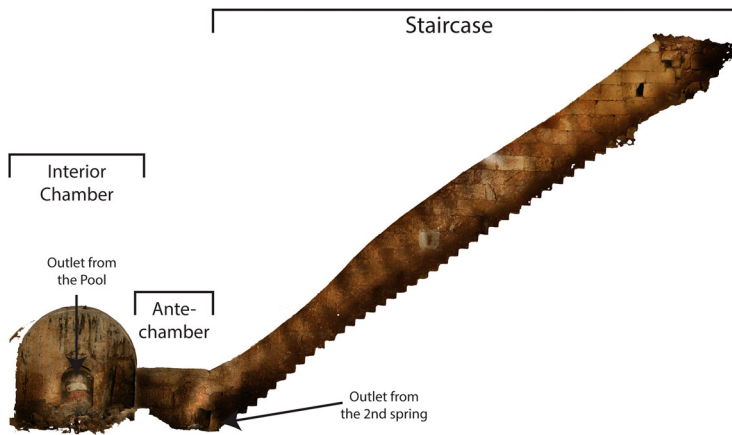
Orthophotographic section through the Dam interior chamber and staircase, facing west.
